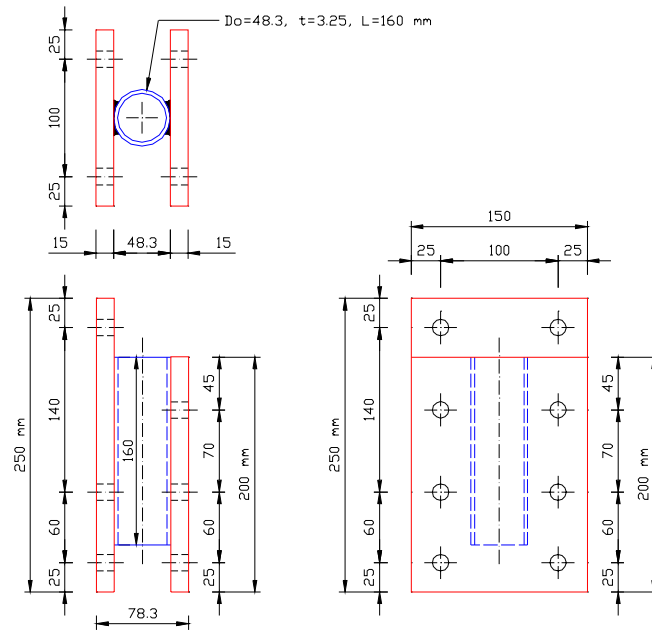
Details of the tested connections of the first Vertically-Laid-Tubes (VLT) series of KHONSAR™ in which one vertical tube was used, VLT1.
